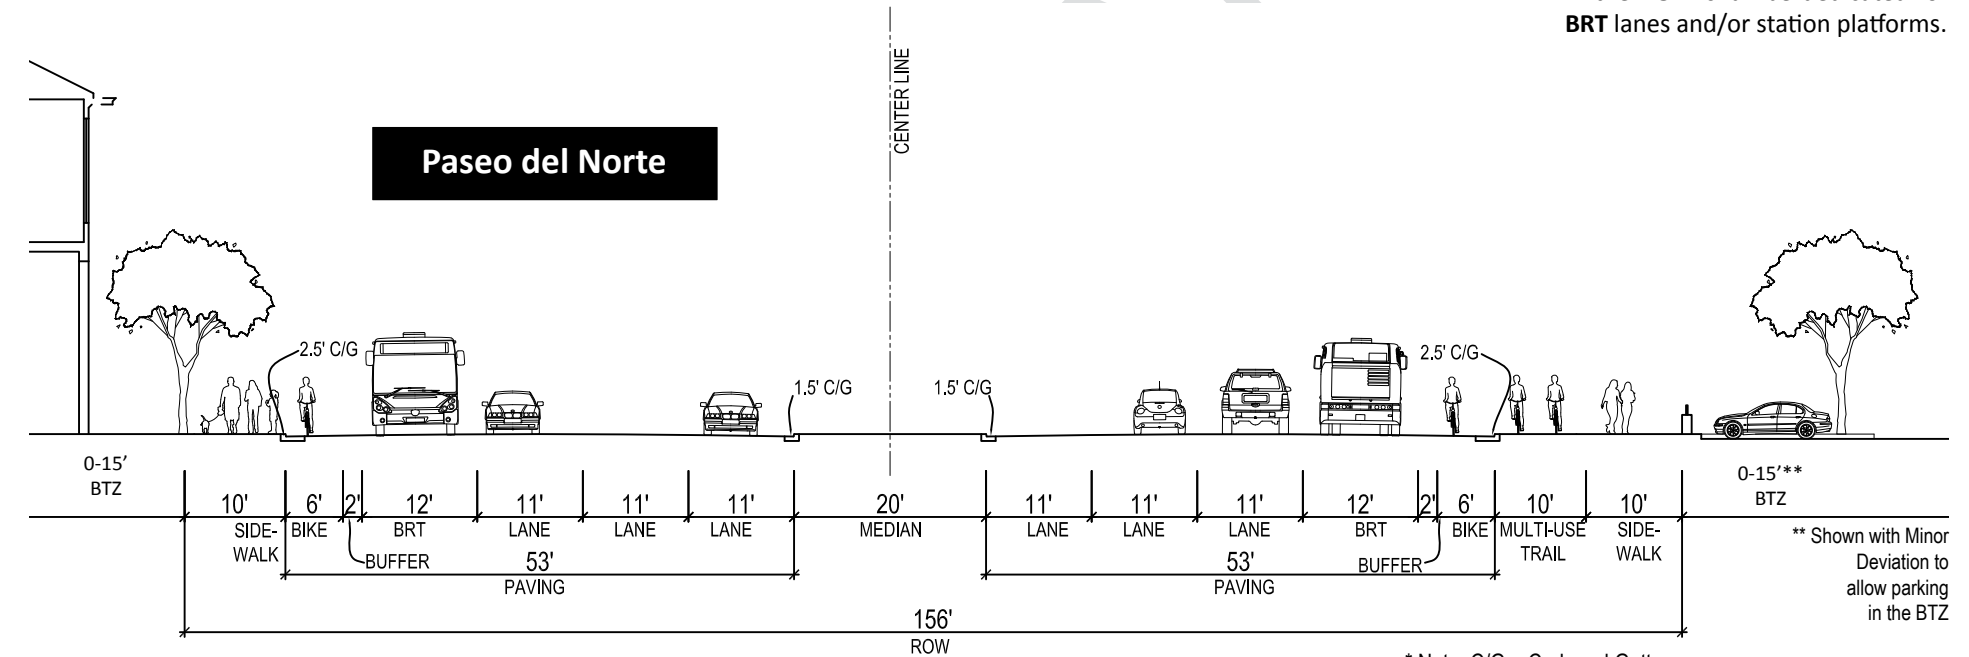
Street Type 7: Paseo del Norte Boulevard Cross Section
